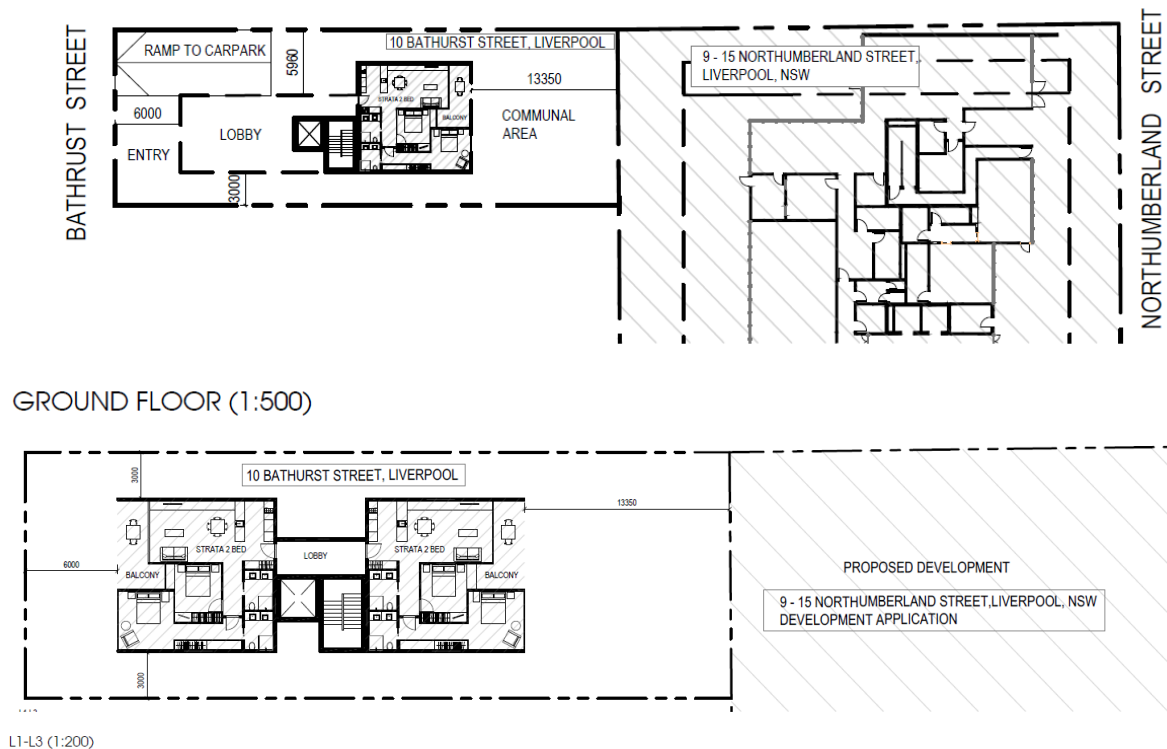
Potential Building Envelope of No.10 Bathurst Street
